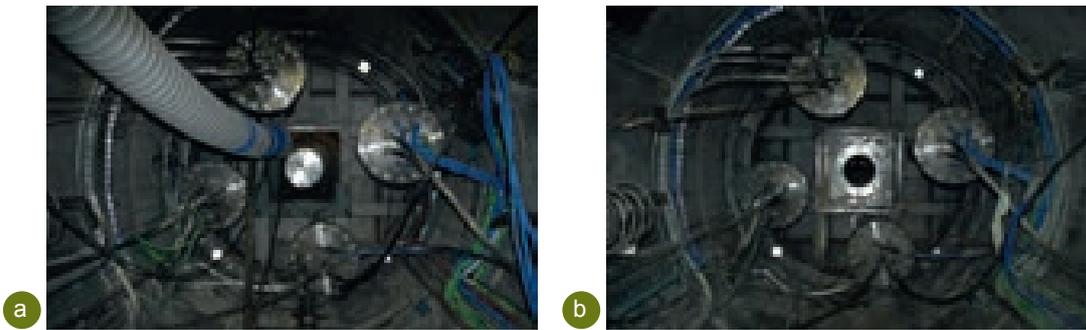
A central plate was welded onto the hydraulic seal and the central tube to close the manhole: (a) before the welding of the central plate; (b) after the welding of the central plate.
